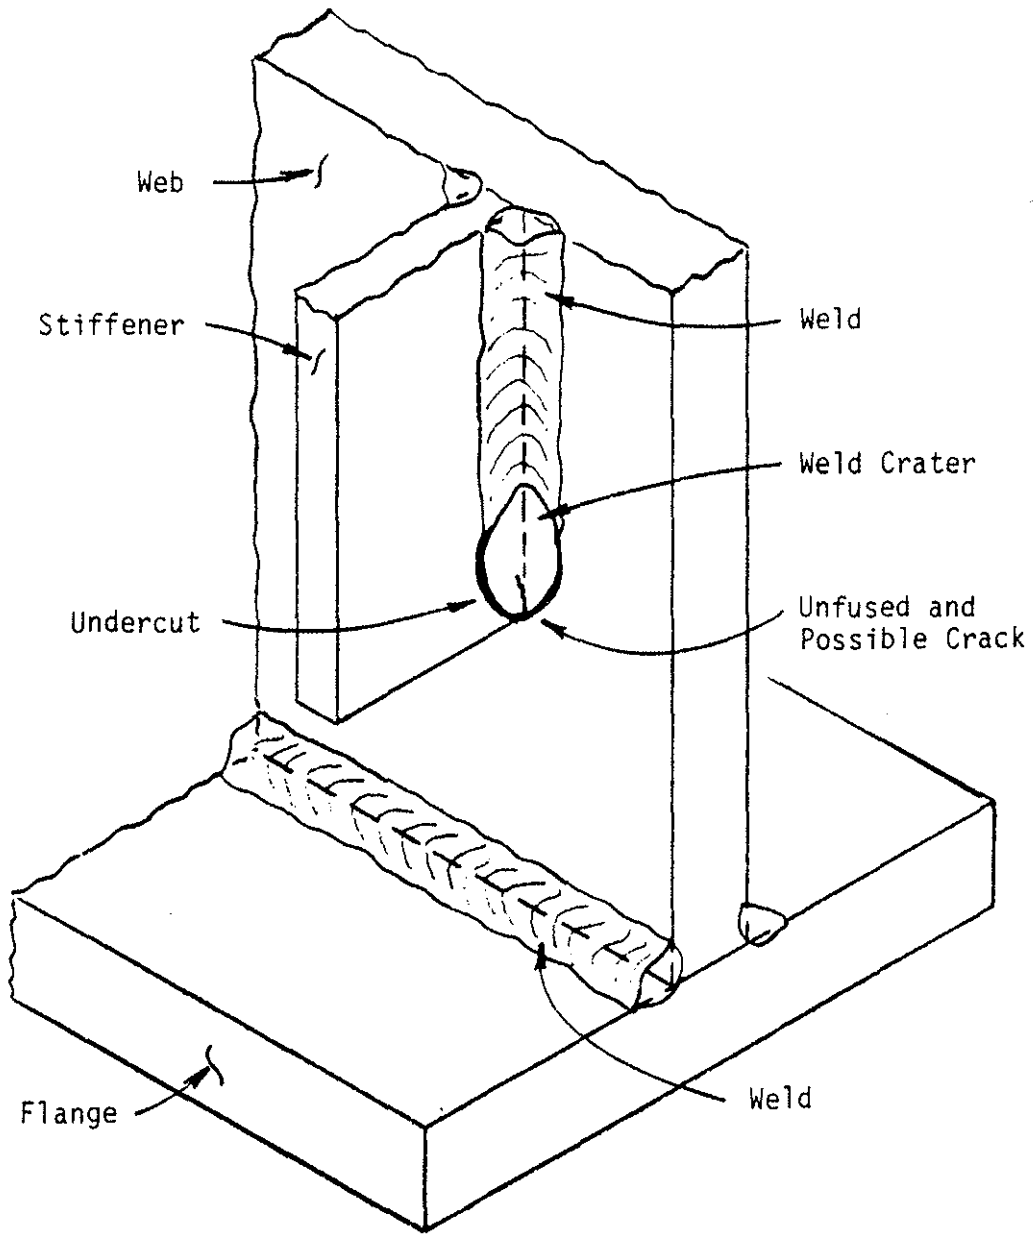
Insufficient Weld at Weld Crater
